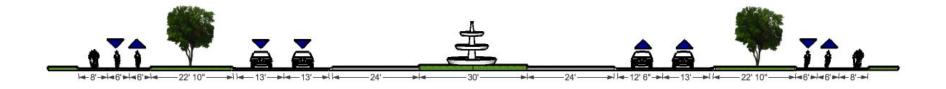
C: Proposed Roundabout Improvements at Preble Street and Old Colony Avenue
